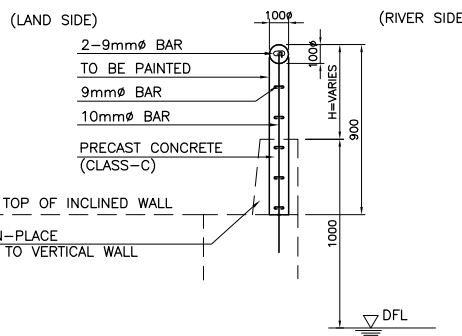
DETAIL OF PRECAST CONCRETE HANDRAILS TYPE-1
